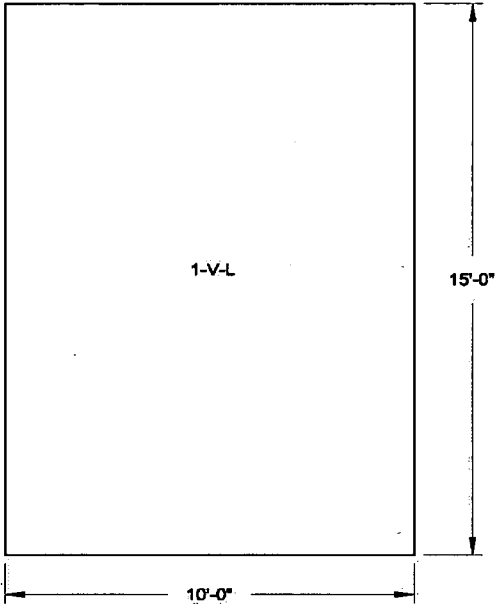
H.8-205: WALL 16 LOOKING FROM OUTSIDE
